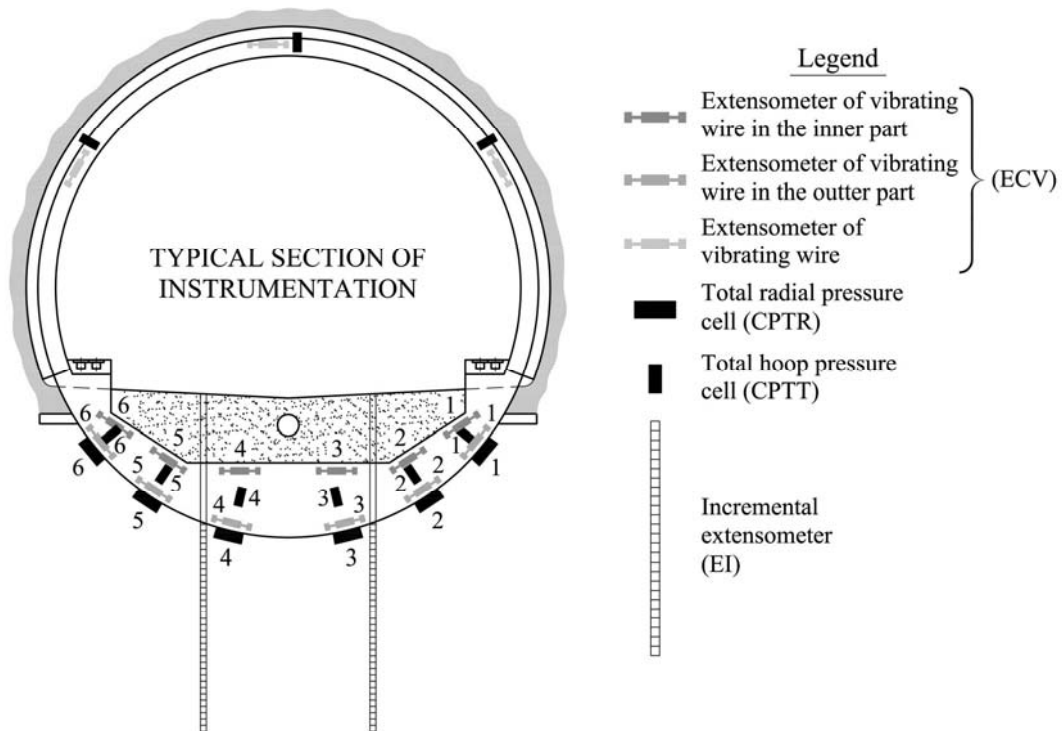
Typical instrumented section of reinforced tunnel with instruments in vault and invert
